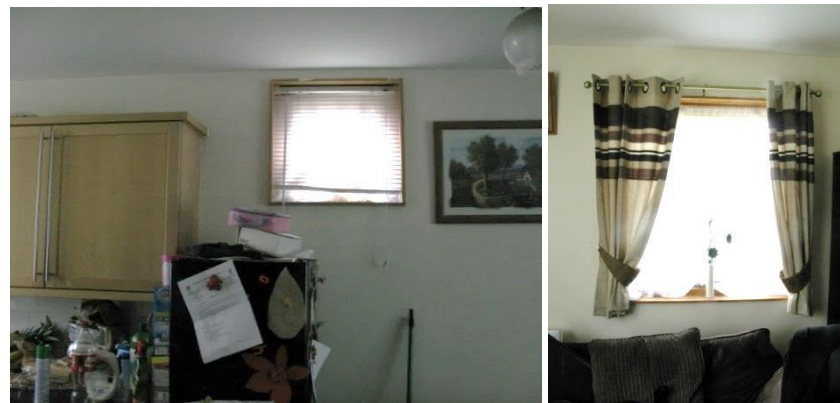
Additional openable window on side elevations in kitchen (Sabeen, left) and living room (Karen, right)
